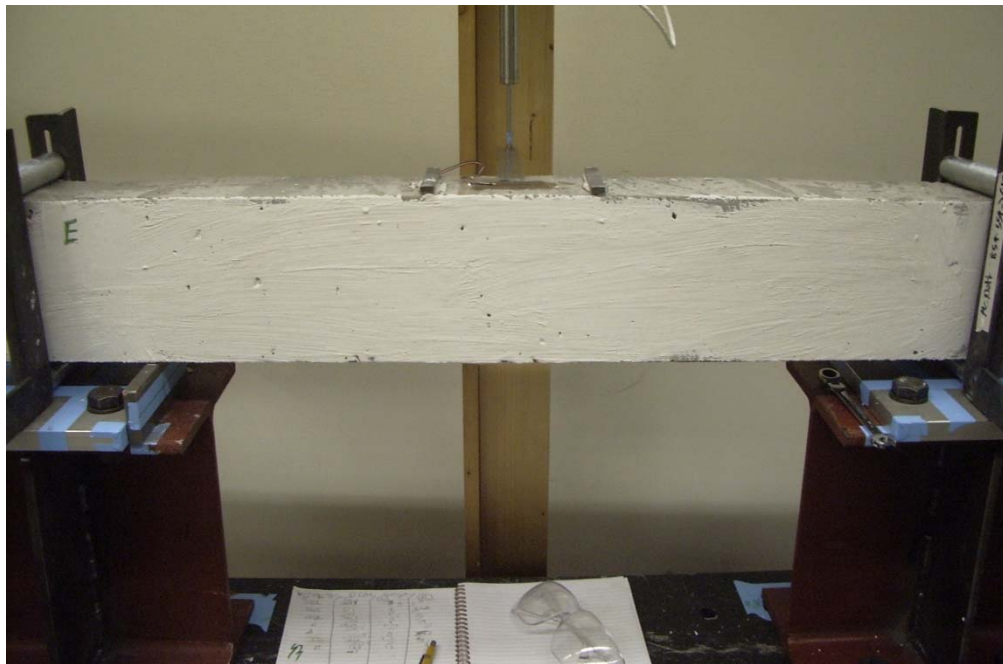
Preliminary load testing of a reinforced concrete beam [63].
